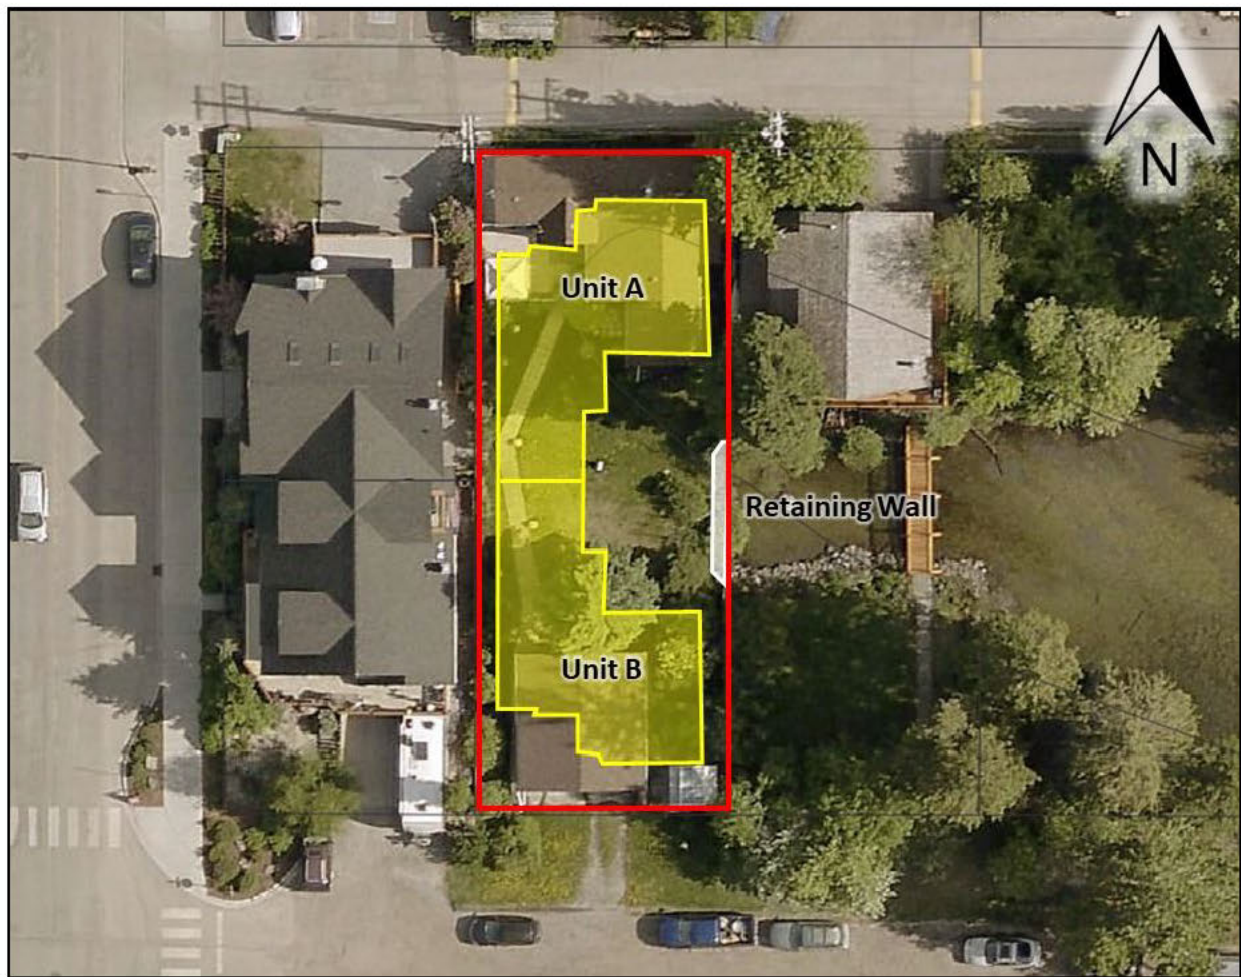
shows the existing conditions with the proposed development plan overlaid. It appears that the large coniferous tree near the garage will need to be removed to facilitate this proposed development and the western half of the grassed lawn would be developed.
